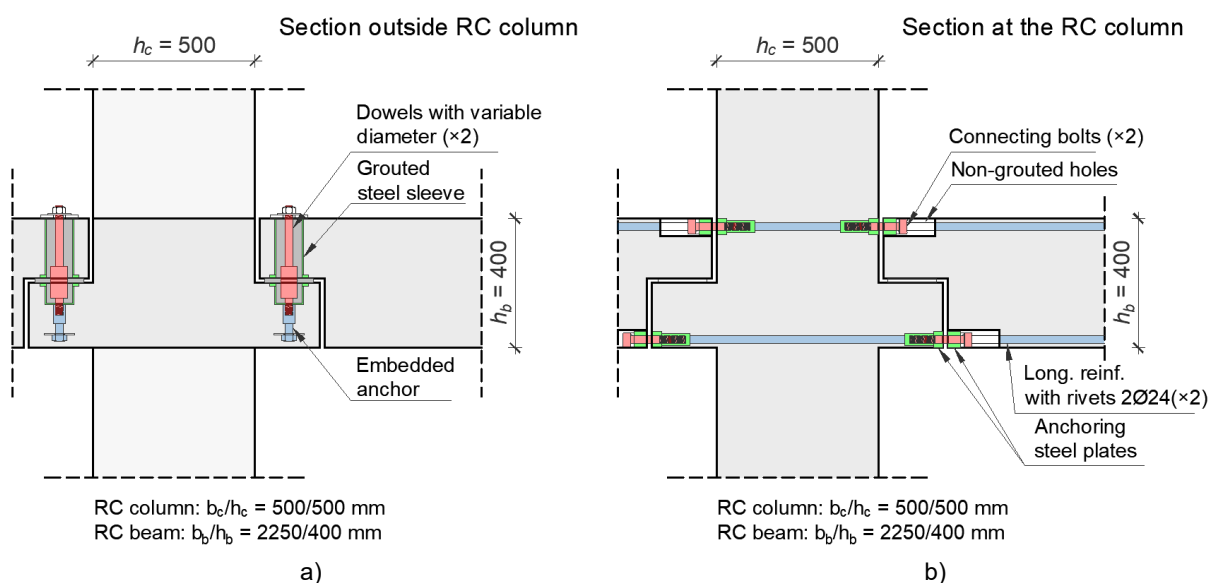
Beam-to-column joints with dapped-end beam: a) pinned connection with dowels, b) moment connection with thick steel plates, longitudinal reinforcement with enlarged ends and demountable bolts (adapted from [17] and [18])
